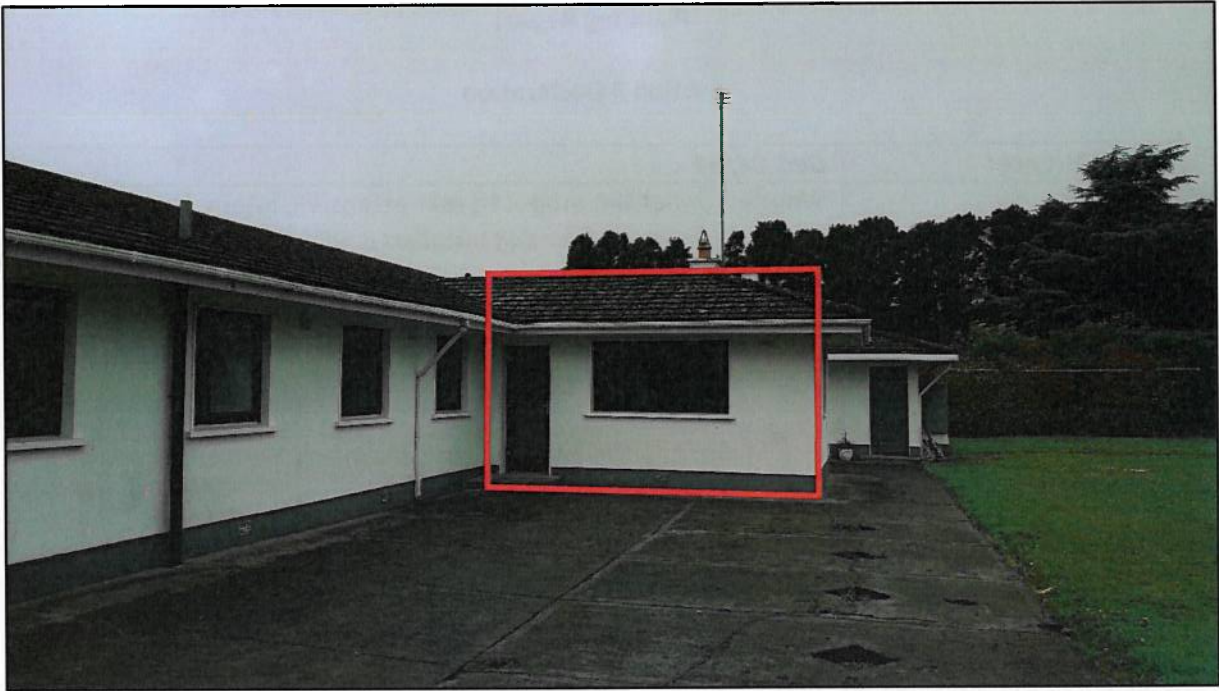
Rear of dwelling showing living room (outlined in red) to be extended
